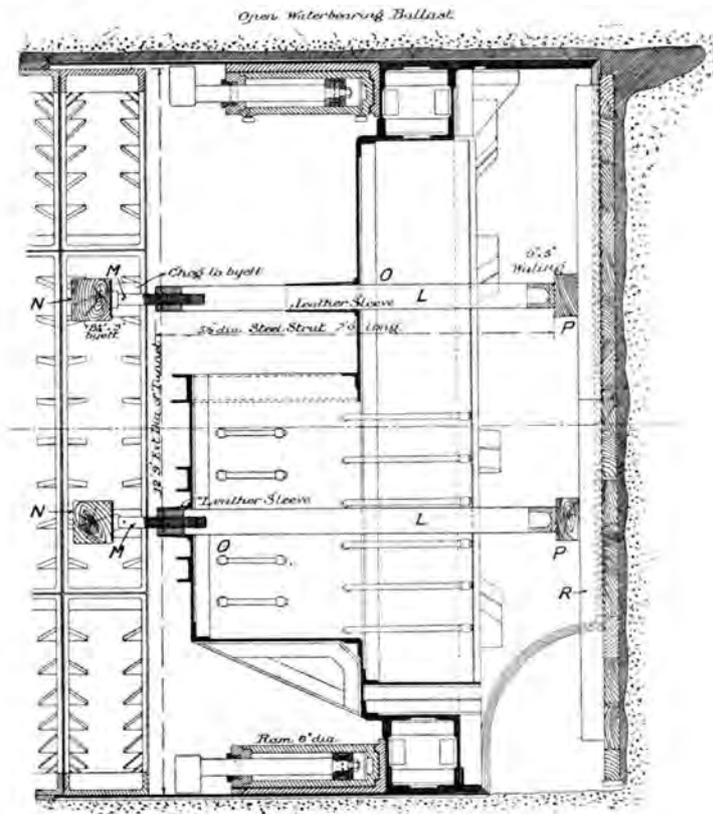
BAKER STREET AND WATERLOO RAILWAY.
